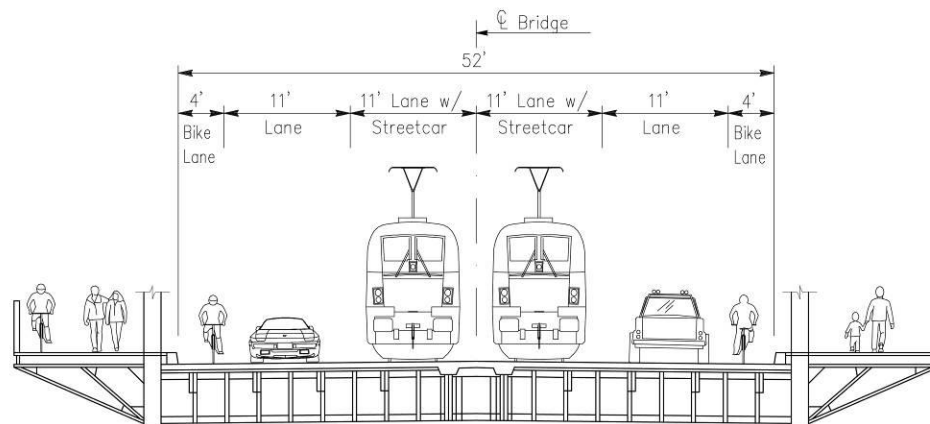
Typical Section of Tower Bridge showing lane configuration Alternative 3 - one through traffic lane and one mixed-flow traffic/streetcar lane in each direction, with shoulders/bike lanes.
